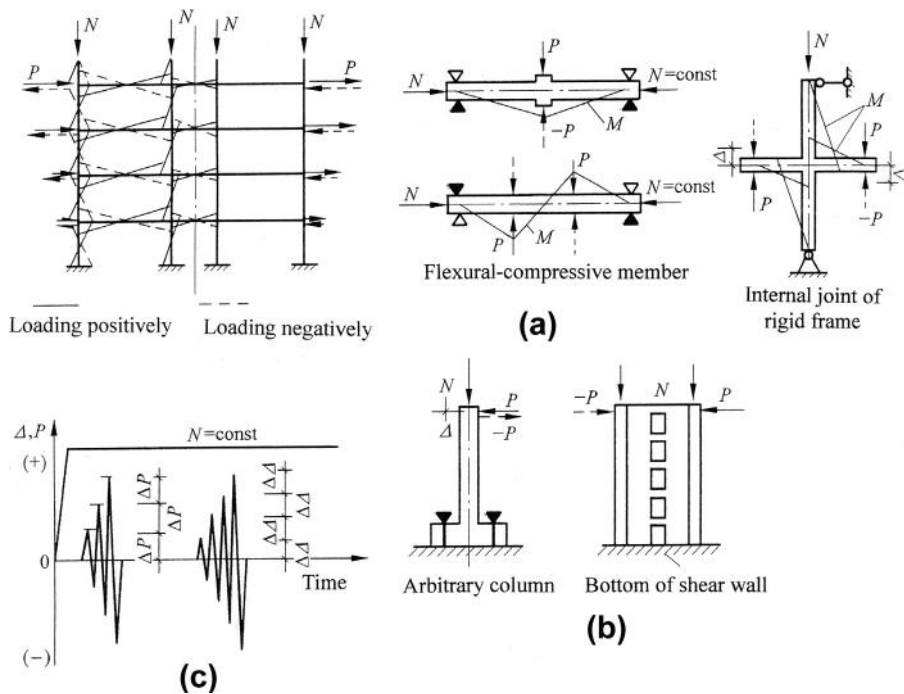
Test of specimen under reversed load of low cycles: (a) load and internal force of frame structure, (b) tests of structural members and joints, (c) loading procedure
